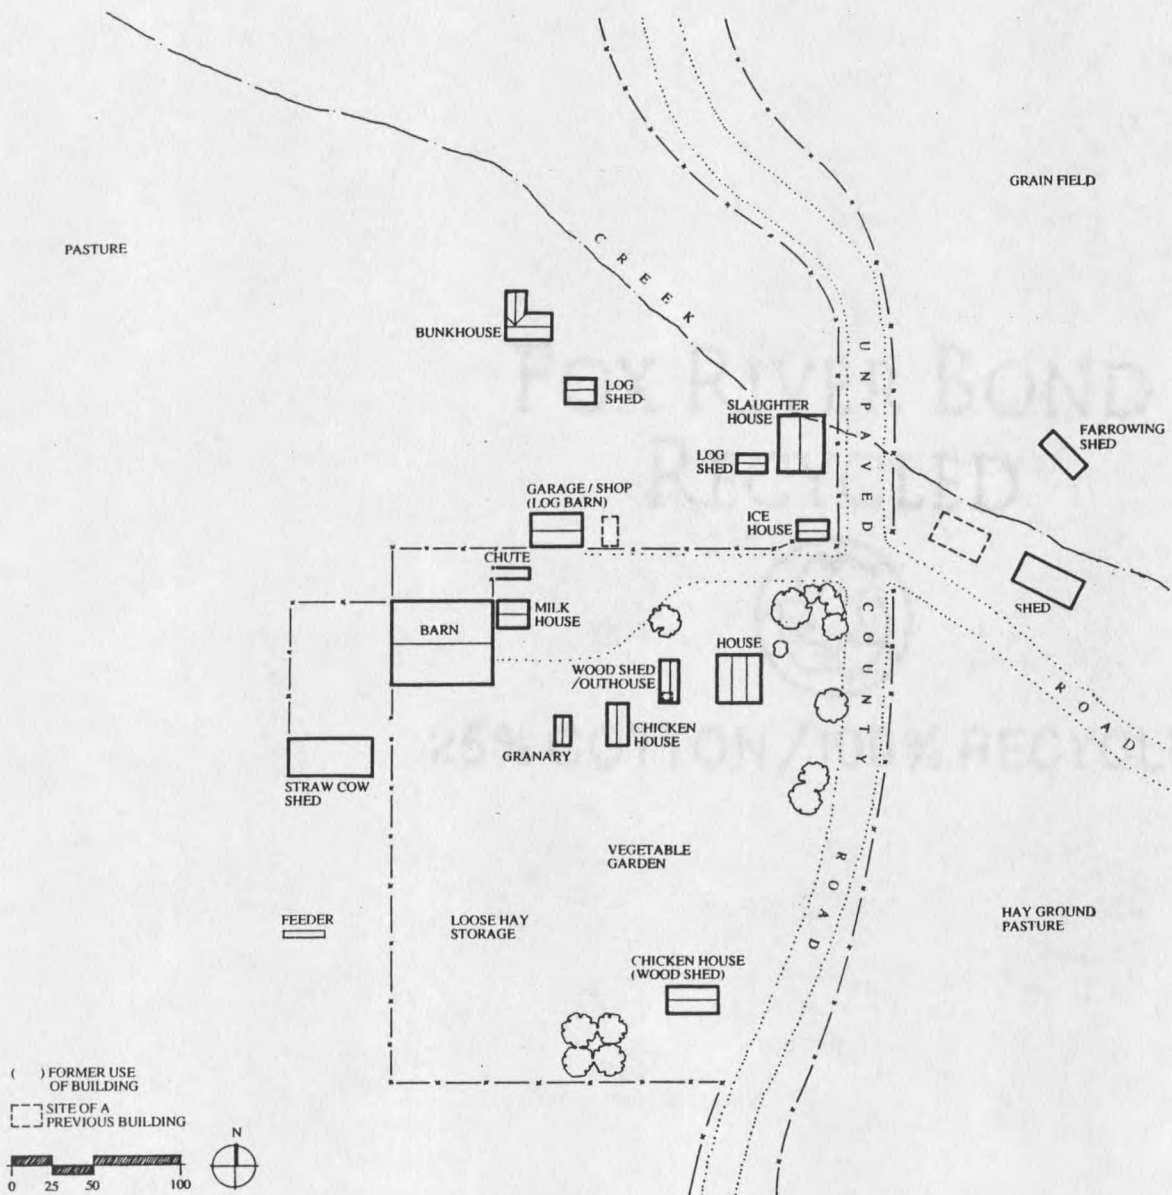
Site #1 - Site plan from 1916 to 1930. Five new structures were built, two were moved, and one was demolished.
